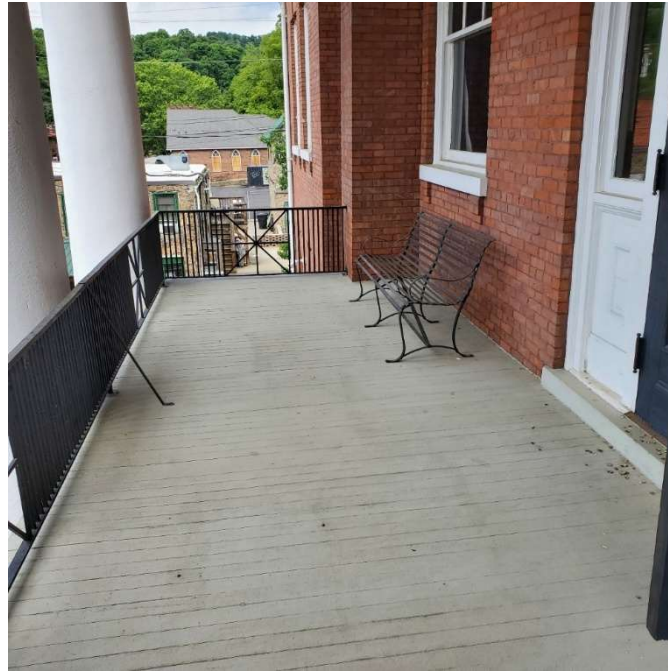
Second Floor – Front Porch adjacent to Courtroom
